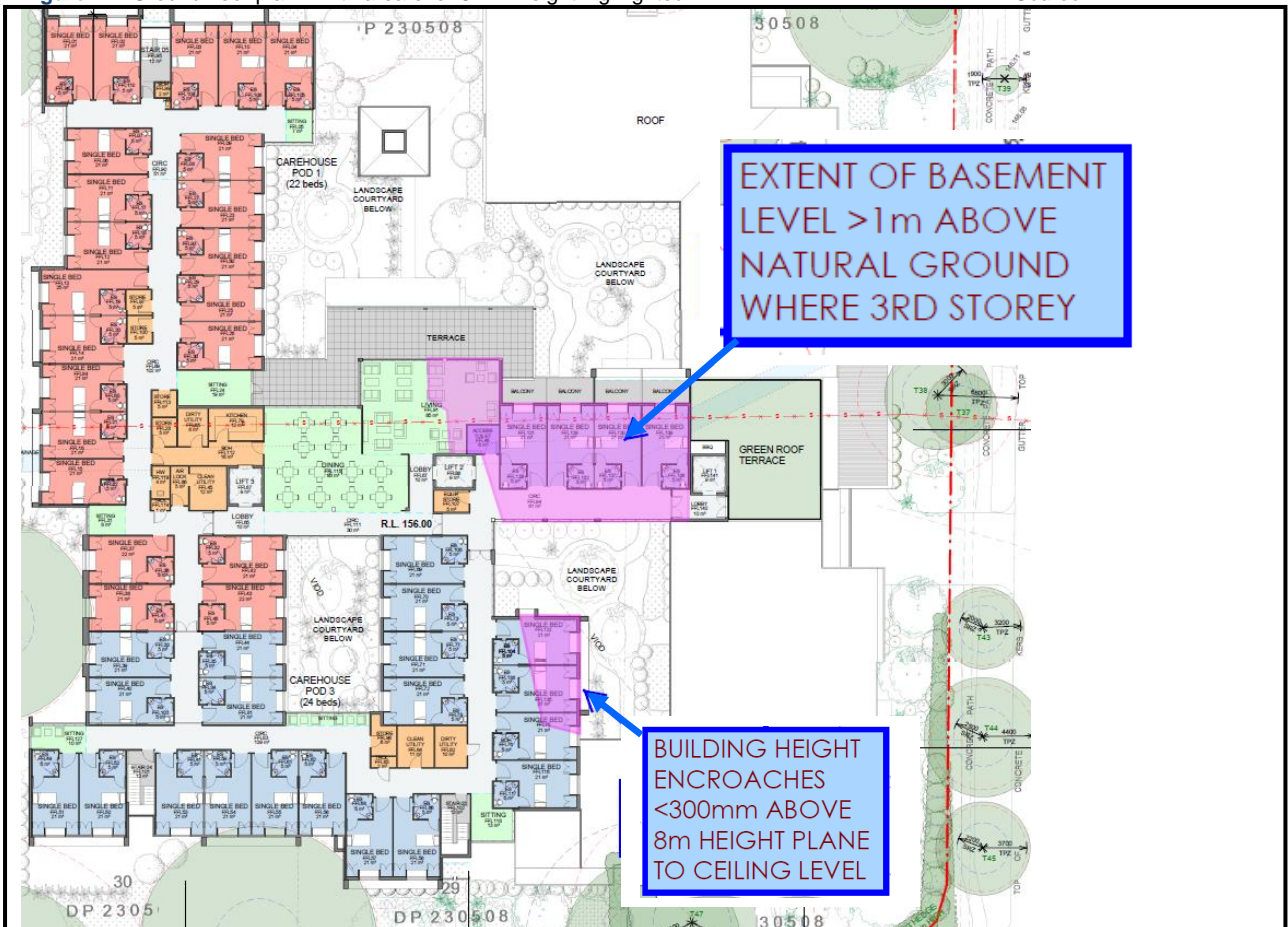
First floor plan – with area of 8m height exceedance and 3rd storey sections highlighted
